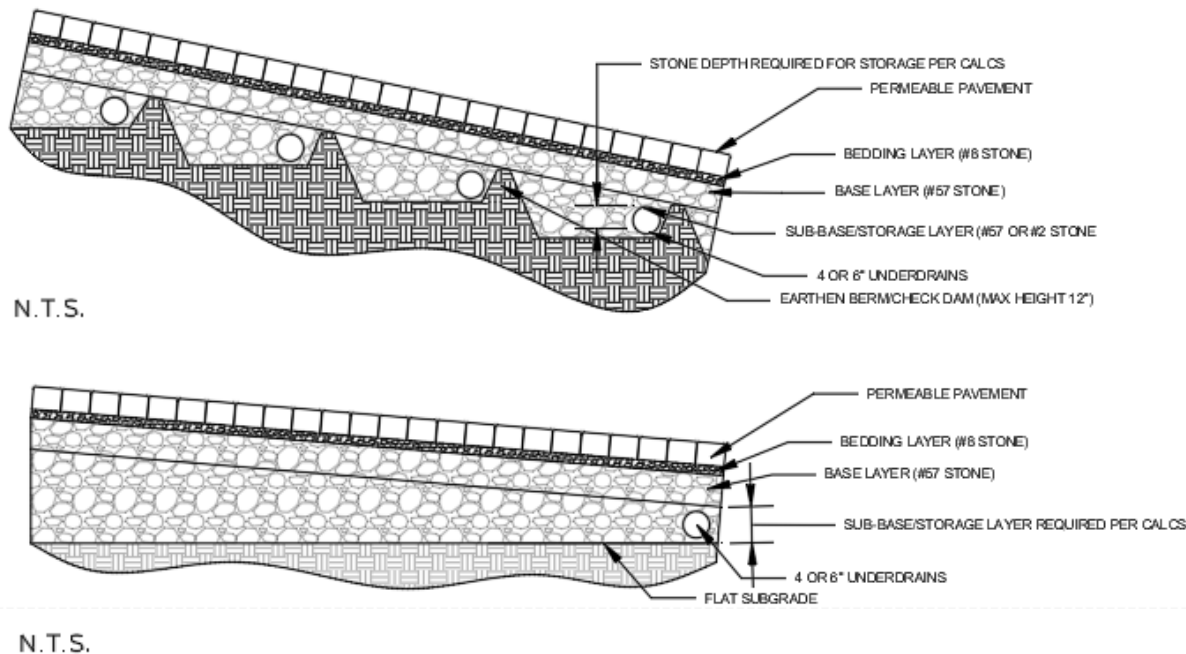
Typical Detail of Terraced and Flat Subgrade
